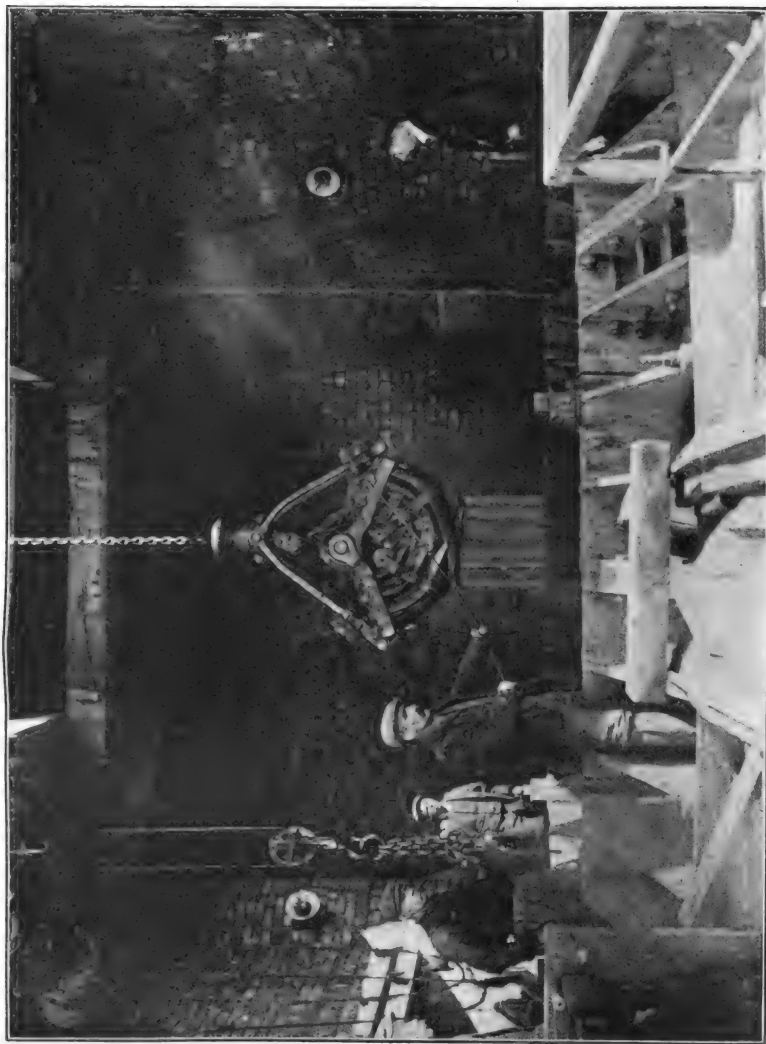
Application of the Sinking Drum Process at a Colliery in the North of England. View at the surface, showing Pressure Ring, tops of Anchor Bolts, Travelling Electric Crane and Grab.
